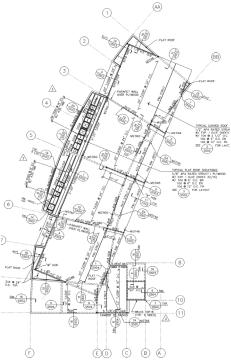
BUILDING 7: 2017 HVAC Upgrade Roof Framing Plan
